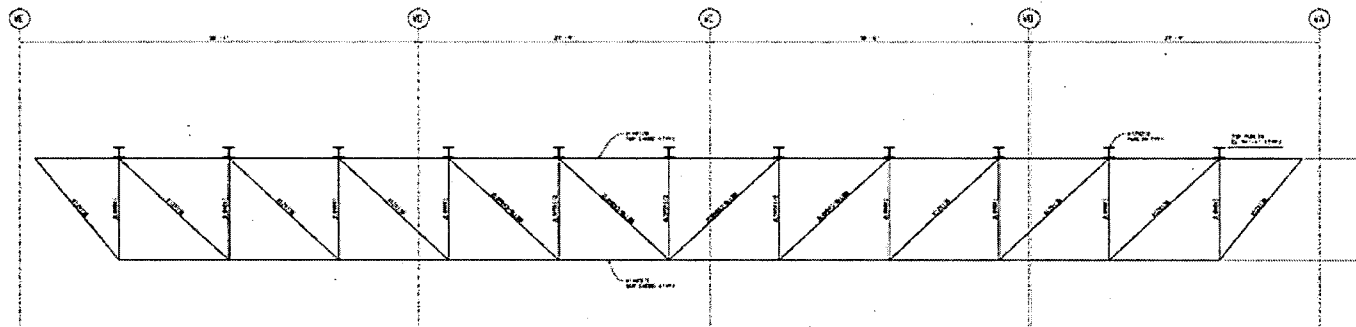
H.3-48 TYPICAL EAST-WEST SPANNING ROOF TRUSS BETWEEN COLUMN LINES W7-W8 (ELEVATION VIEW)
